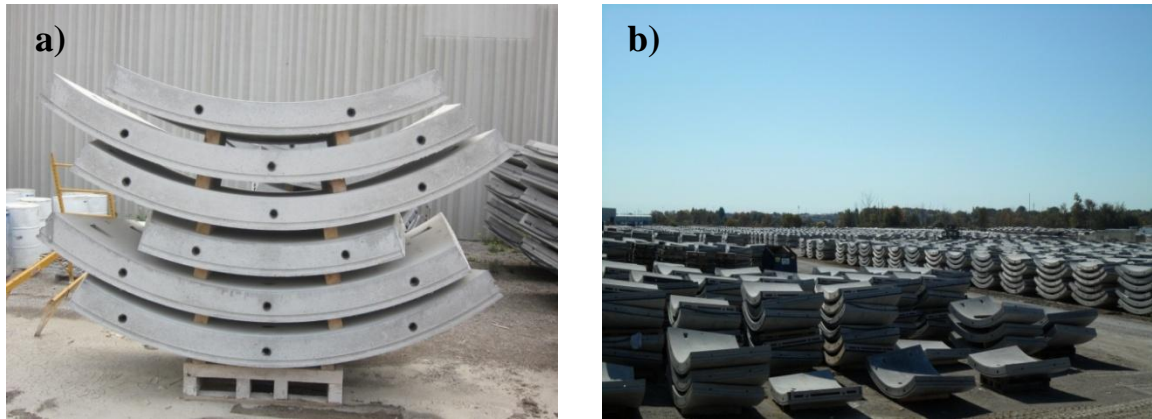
Precast segment linings (a) a stacked full tunnel ring, (b) storage yard
